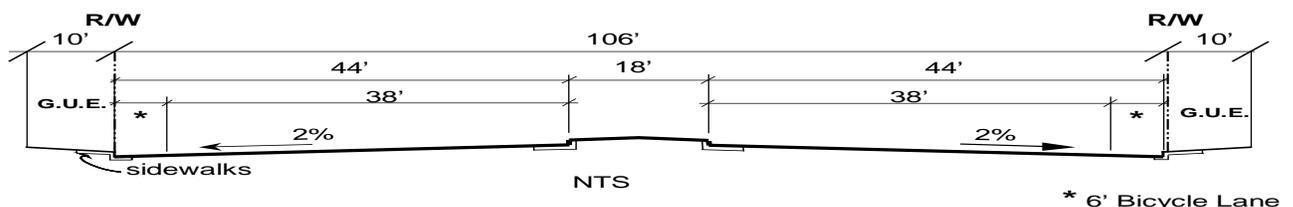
PRIME ARTERIAL – TYPICAL SECTION
